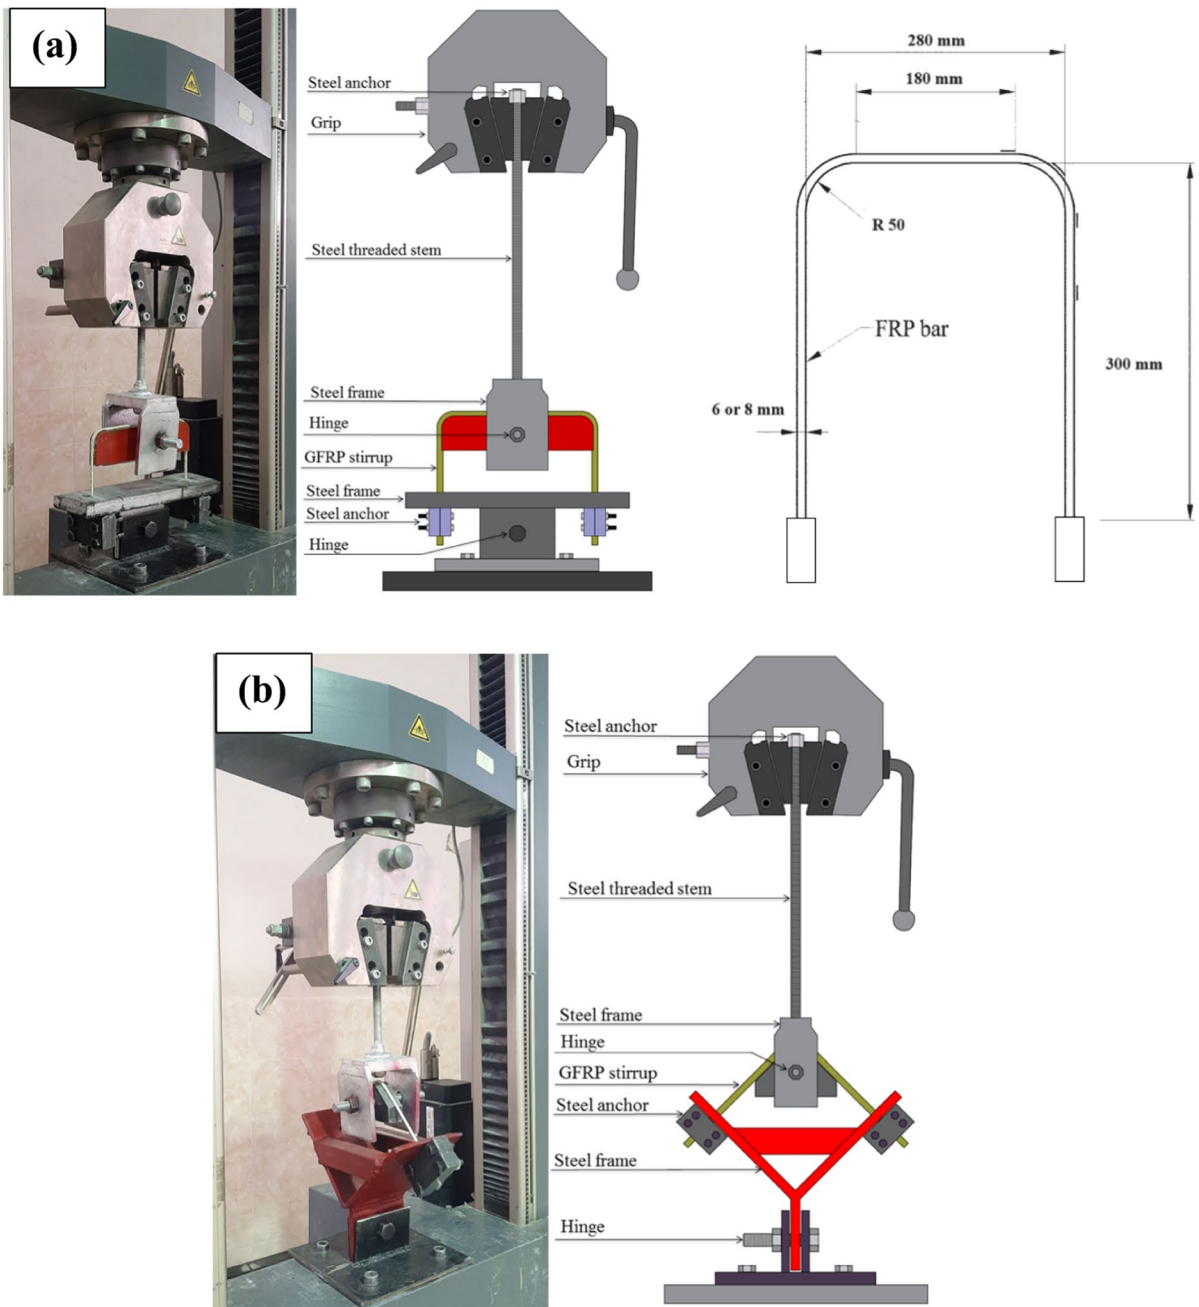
Test set-up: a Testing configuration of U-shaped stirrup specimens, and b Testing configuration of L-shaped stirrup specimens
